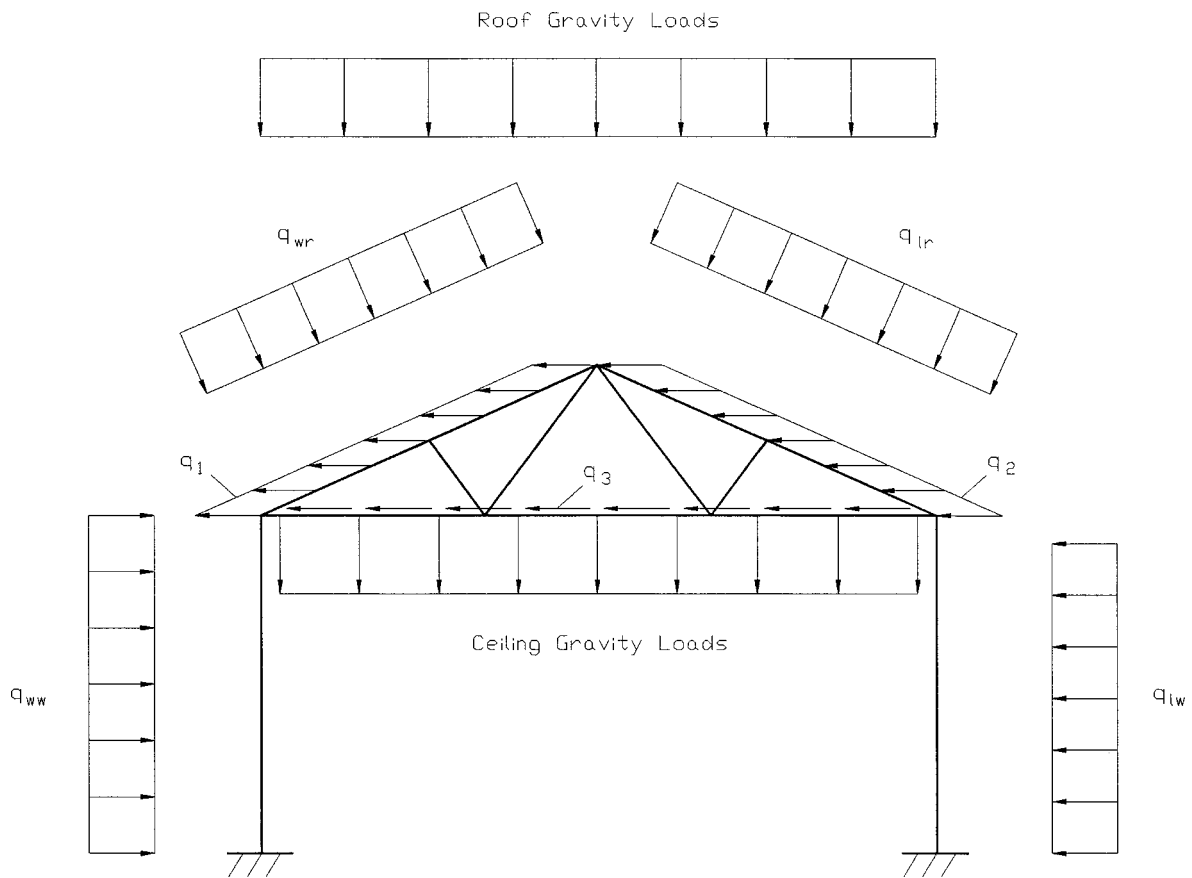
Structural analog for a building with roof and ceiling diaphragms; sideways restraining forces, Q_i 's, converted to distributed loads, q_i 's
